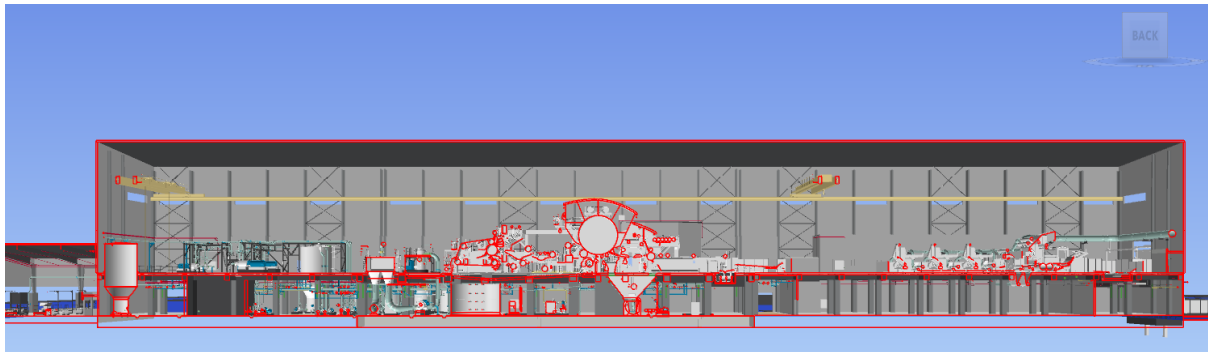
Three-dimensional cross-sectional view of the full basement machine hall layout
